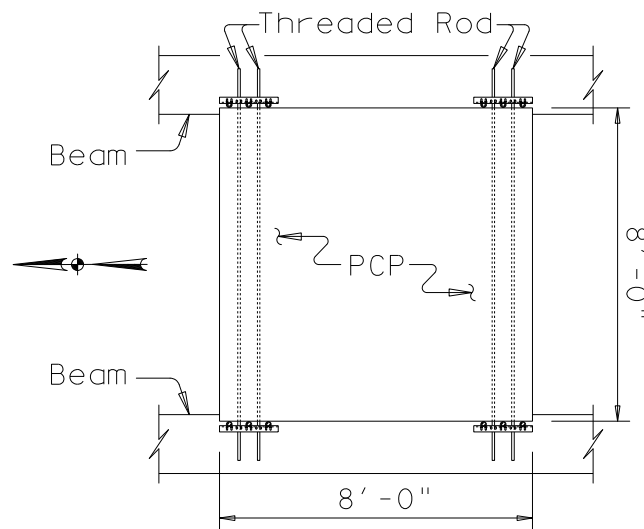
Plan View of Shear Stud Connection PCP Specimen
